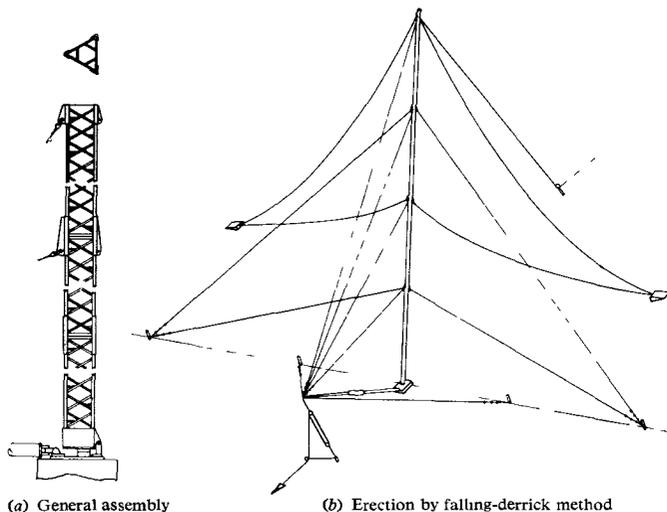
CONSTRUCTION AND ERECTION OF MAST
